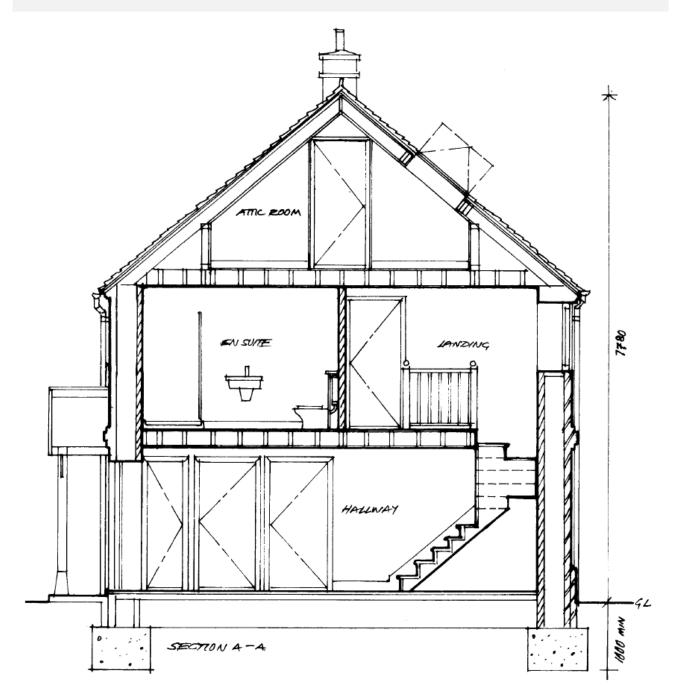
Cross Section. Drawing by Lacey Interior Architecture Ltd.
